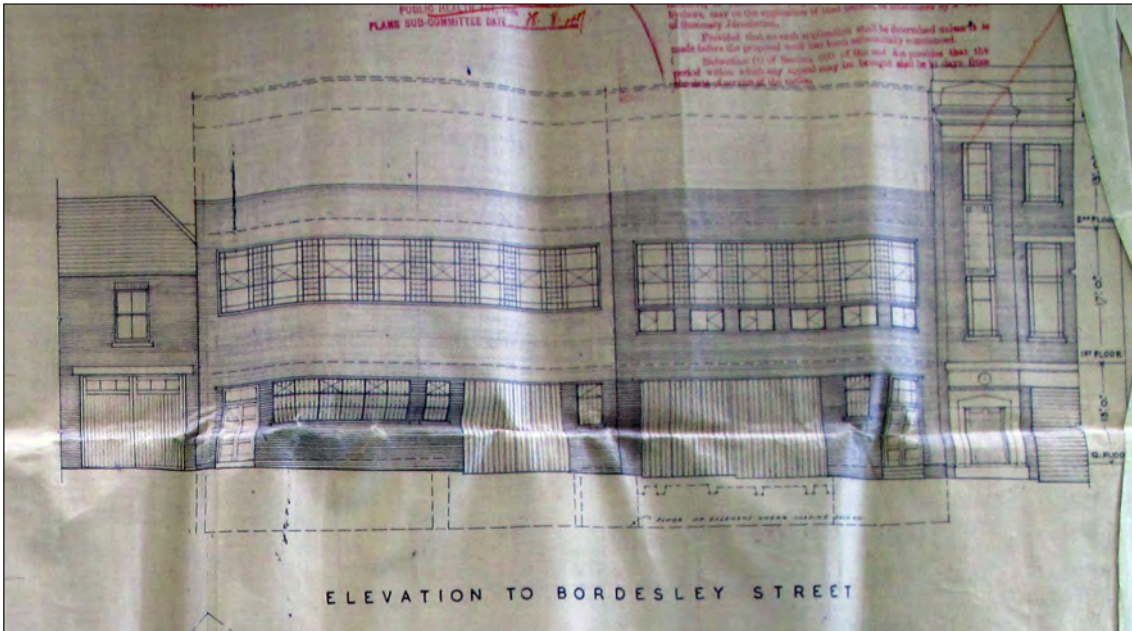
Elevation to Bordesley Street of the new packing warehouse, 1947, H.W. Weedon (Birmingham Archives and Collections, BBP84670, reproduced with the permission of Weedon Architects)
